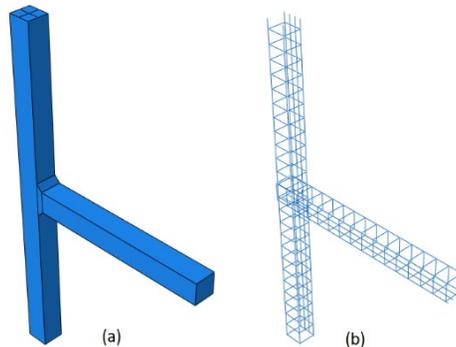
ABAQUS modelling of (a) tie connection with notch, and (b) reinforcement
